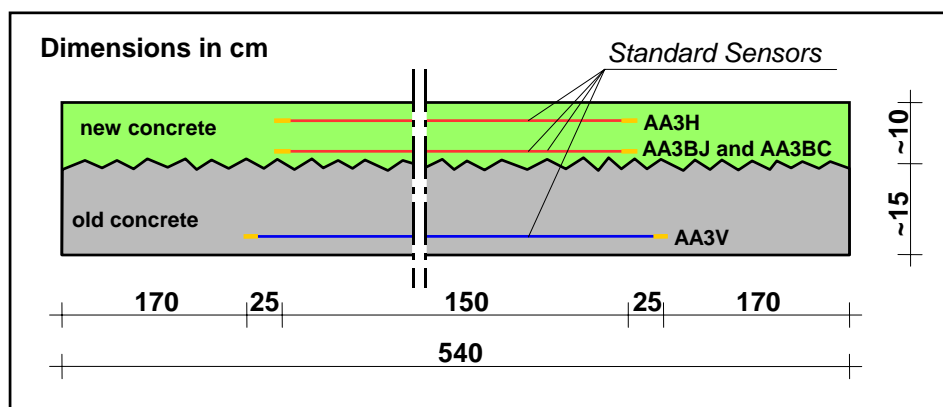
Geometry and sensor emplacement in hybrid old concrete-new concrete specimen AA3
